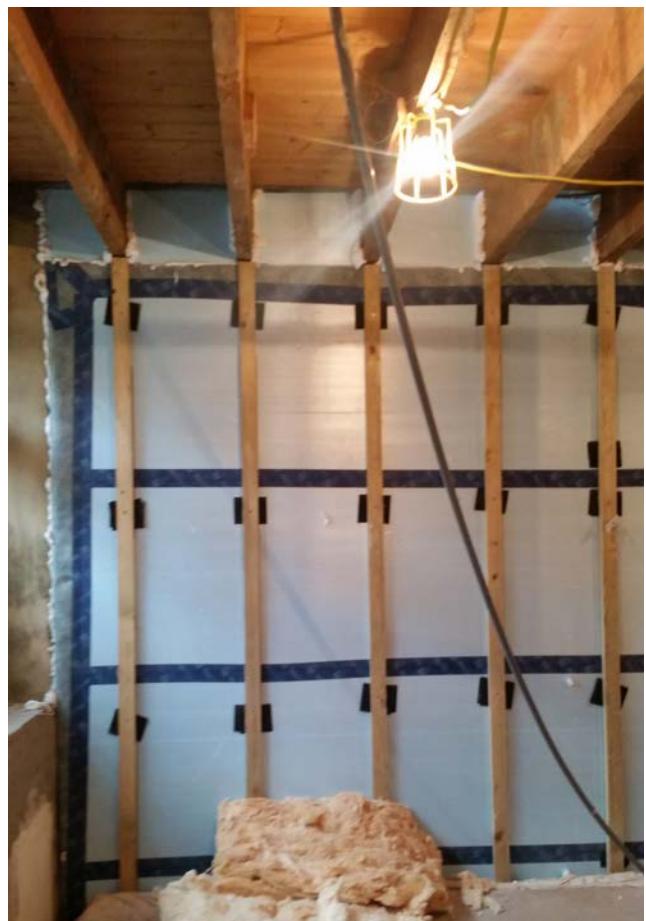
Internal wall insulation to original external building envelope which was mostly cavity but solid in isolated location, Marion Baeli and Robert Prewett
